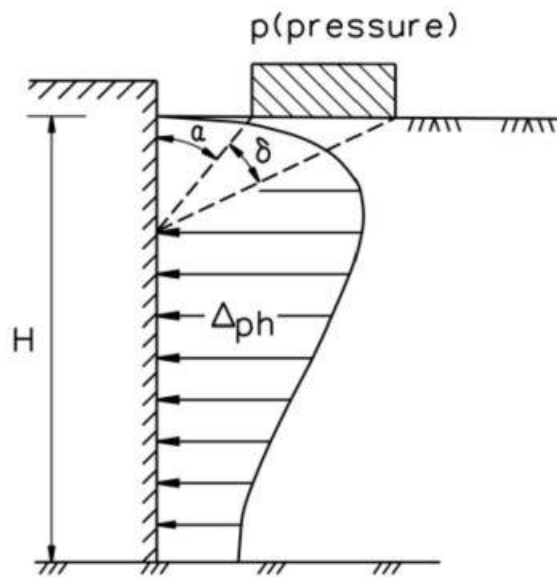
Horizontal Pressure on Wall Caused by a Uniformly Loaded Strip
